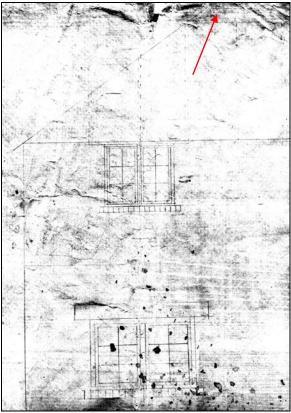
Detail of the top and lower windows and the ridge of the roof indicated by red arrow.
